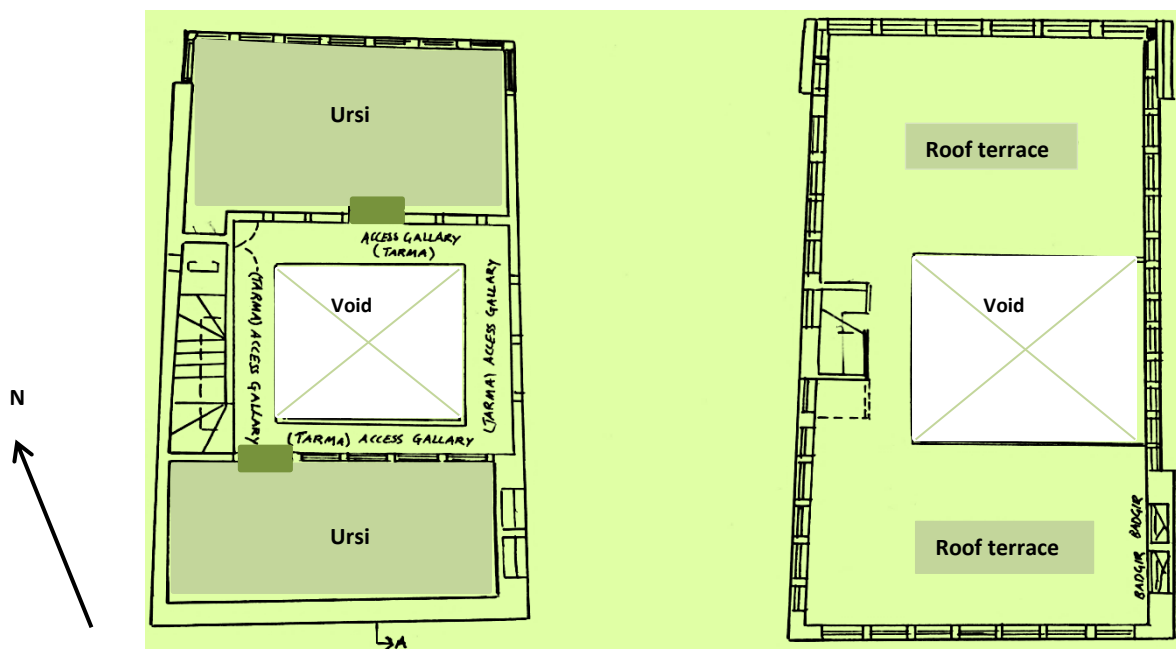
First floor level plan showing the Ursi rooms and roof terrace plan of traditional courtyard house No. 1. Scale: 1:50
